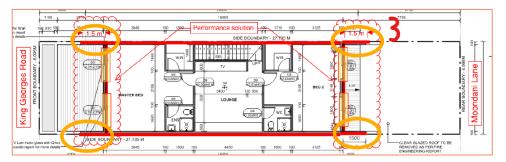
Indicative fire wall markup – Second floor (red solid line: fire wall; yellow shade: non-FRL openings). Note: fire wall and fire rating markup may be indicative, and the building shall meet NCC DtS and certifier's requirements for fire rating in the DtS areas
